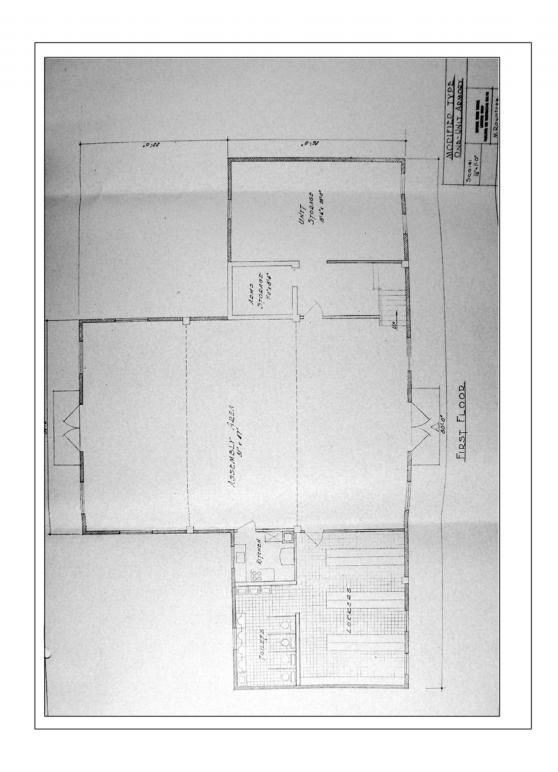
First-floor plan drawing for a one-unit armory, 1948 (courtesy of the National Archives II, College Park, MD, Army-National Guard Bureau Decimal File, 1946-1948, RG 68).
